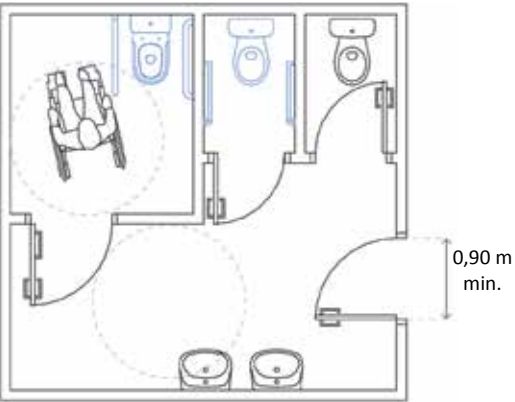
a corner layout accessible toilet with cubicles for dry changing
